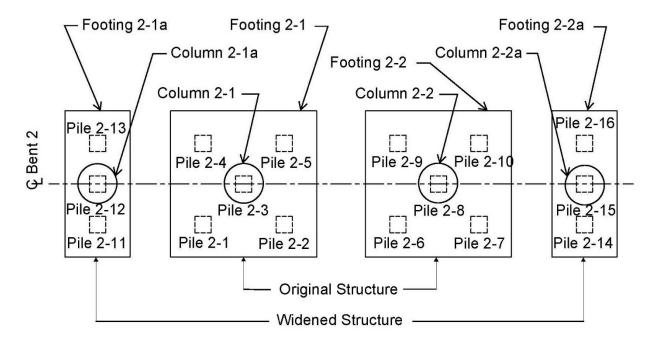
Labeling Convention for Widened Substructure with Added Piles
